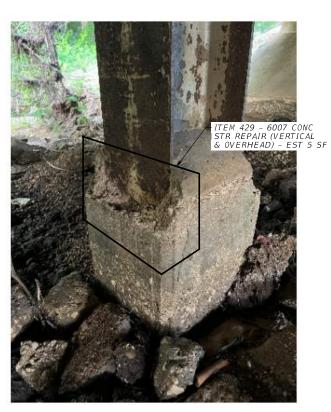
(CONCRETE ENCASEMENT HAS SPALLED OFF ON COLUMN 4 EAST SIDE)
